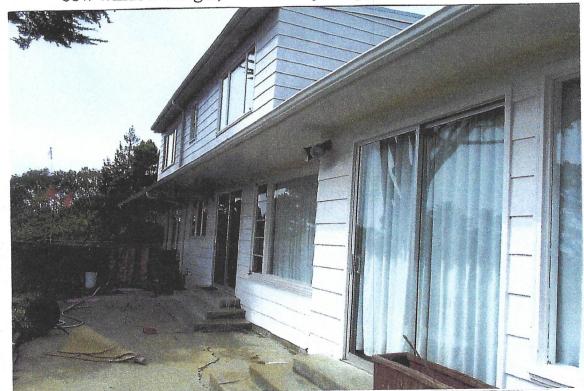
Looking NW at the South facing rear elevation, note complete metal window replacement on this elevation, Kent Seavey, May, 2022.
